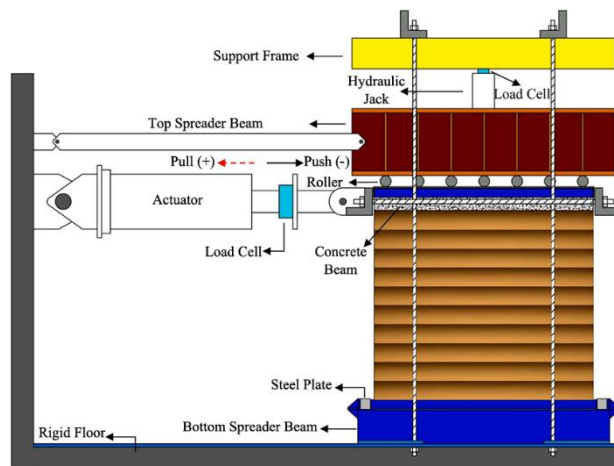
Unstabilized Rammed Earth Wall and test set up.
